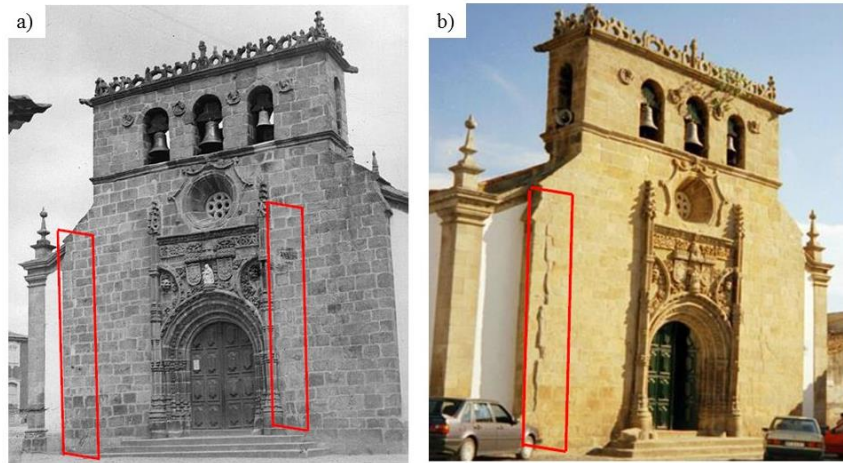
Main façade of the Foz Côa's Church in 1960, undamaged (a), and b) in 1996 with damages [170].
